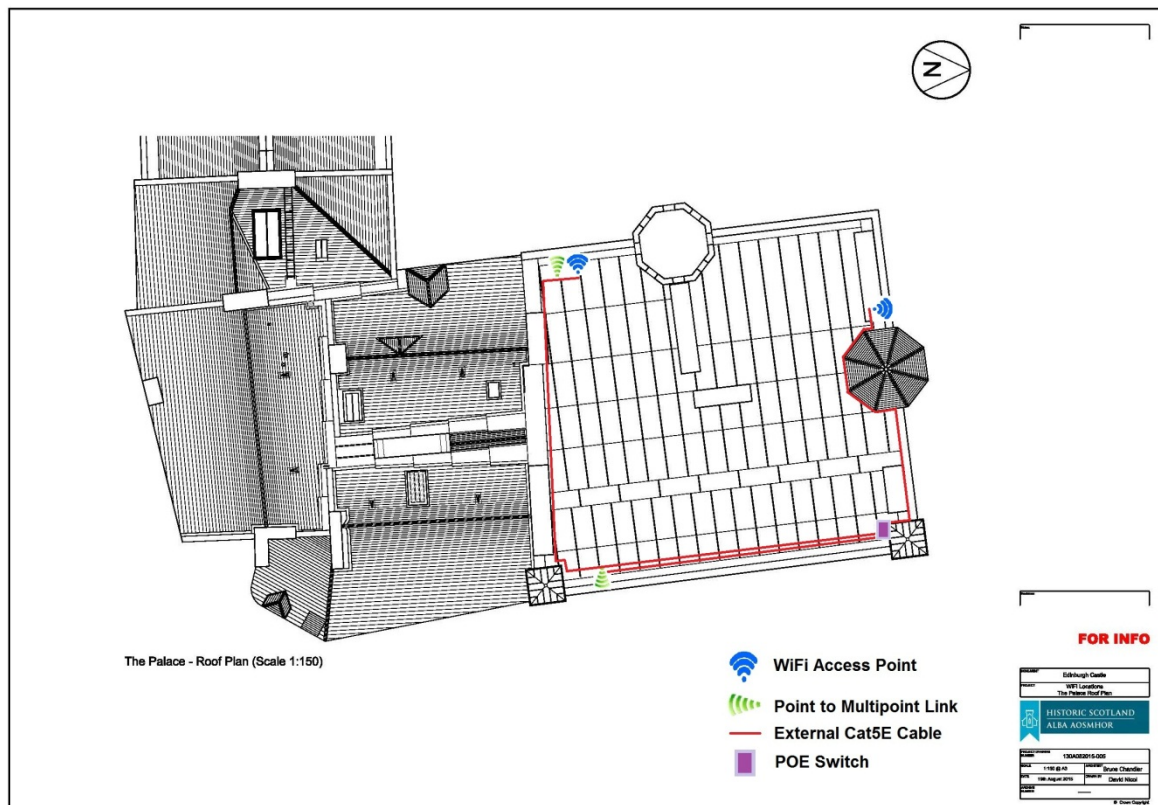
Edinburgh Castle Palace roof proposed switch location at north east turret
